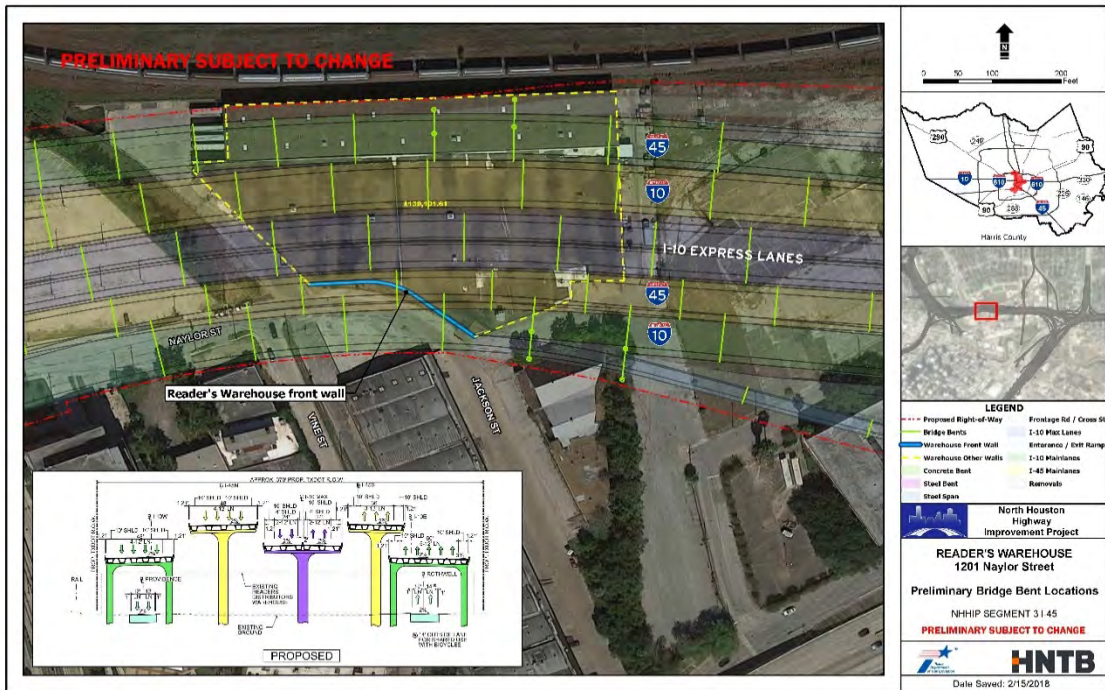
Preliminary design schematic exhibit showing Readers Distributors Warehouse building in relation to the Proposed Action.
